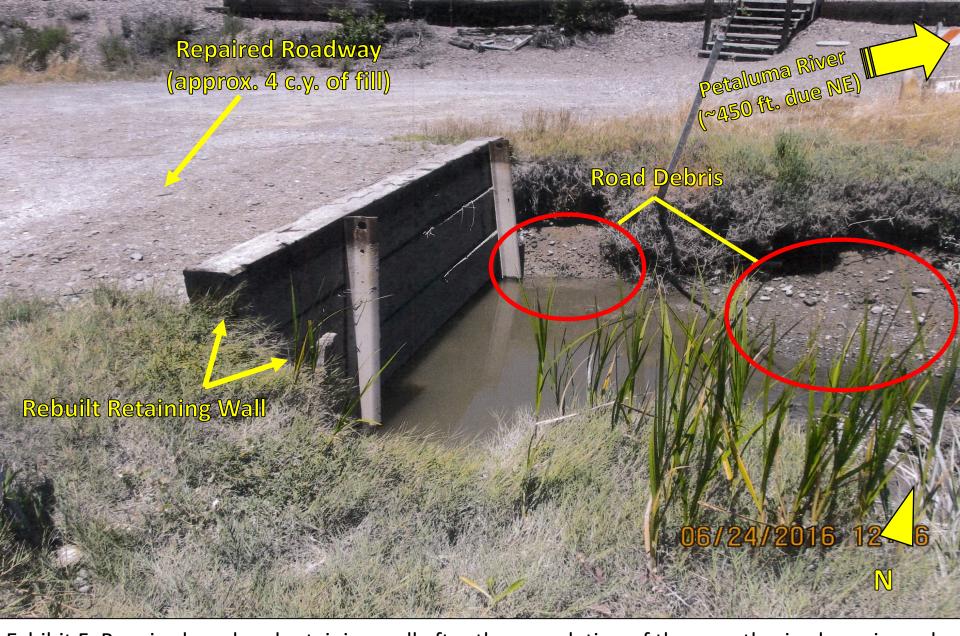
Exhibit F: Repaired road and retaining wall after the completion of the unauthorized repair work in March 2016. Debris from the prior road damage episode(s) was left in the slough. (Photo credit: BCDC staff, June 24, 2016)
